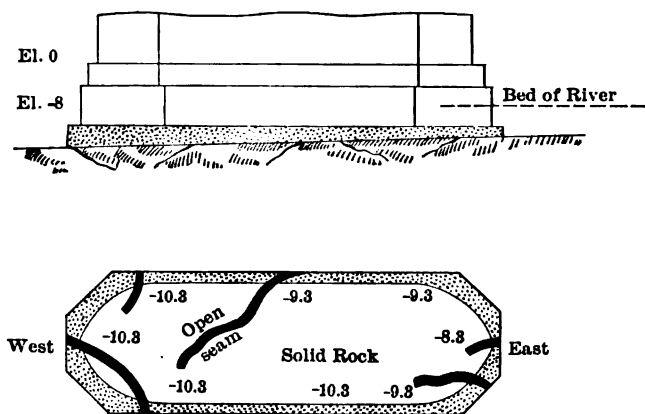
CHATTANOOGA BRIDGE, BED-ROCK PIER No. 3.
